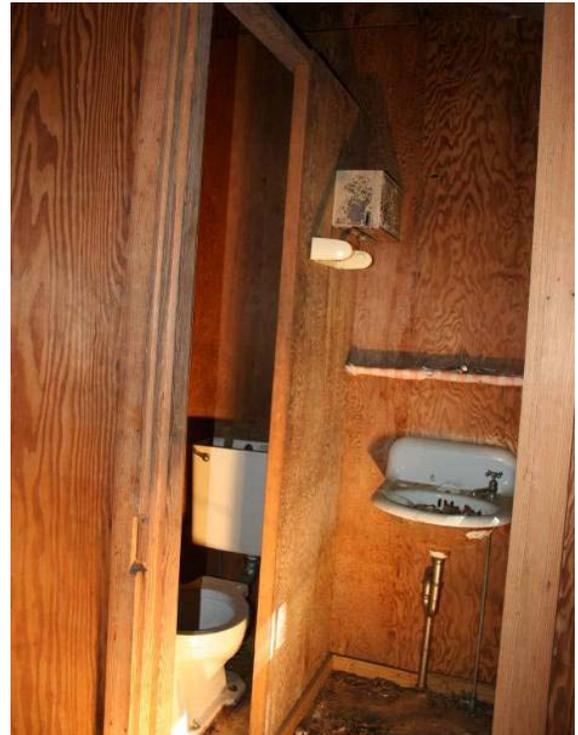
Toilet Room/ Room 106, looking southeast.
